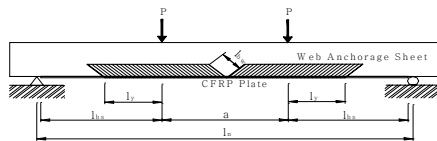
Detail of web anchorage in R.C beam bonded CFRP
